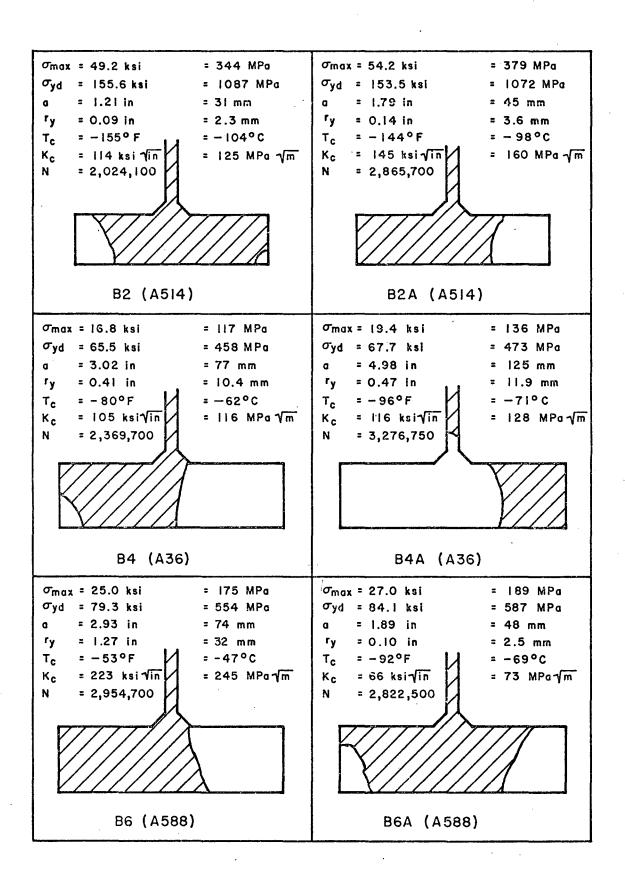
Fracture Surface Sketches and Data Summary
